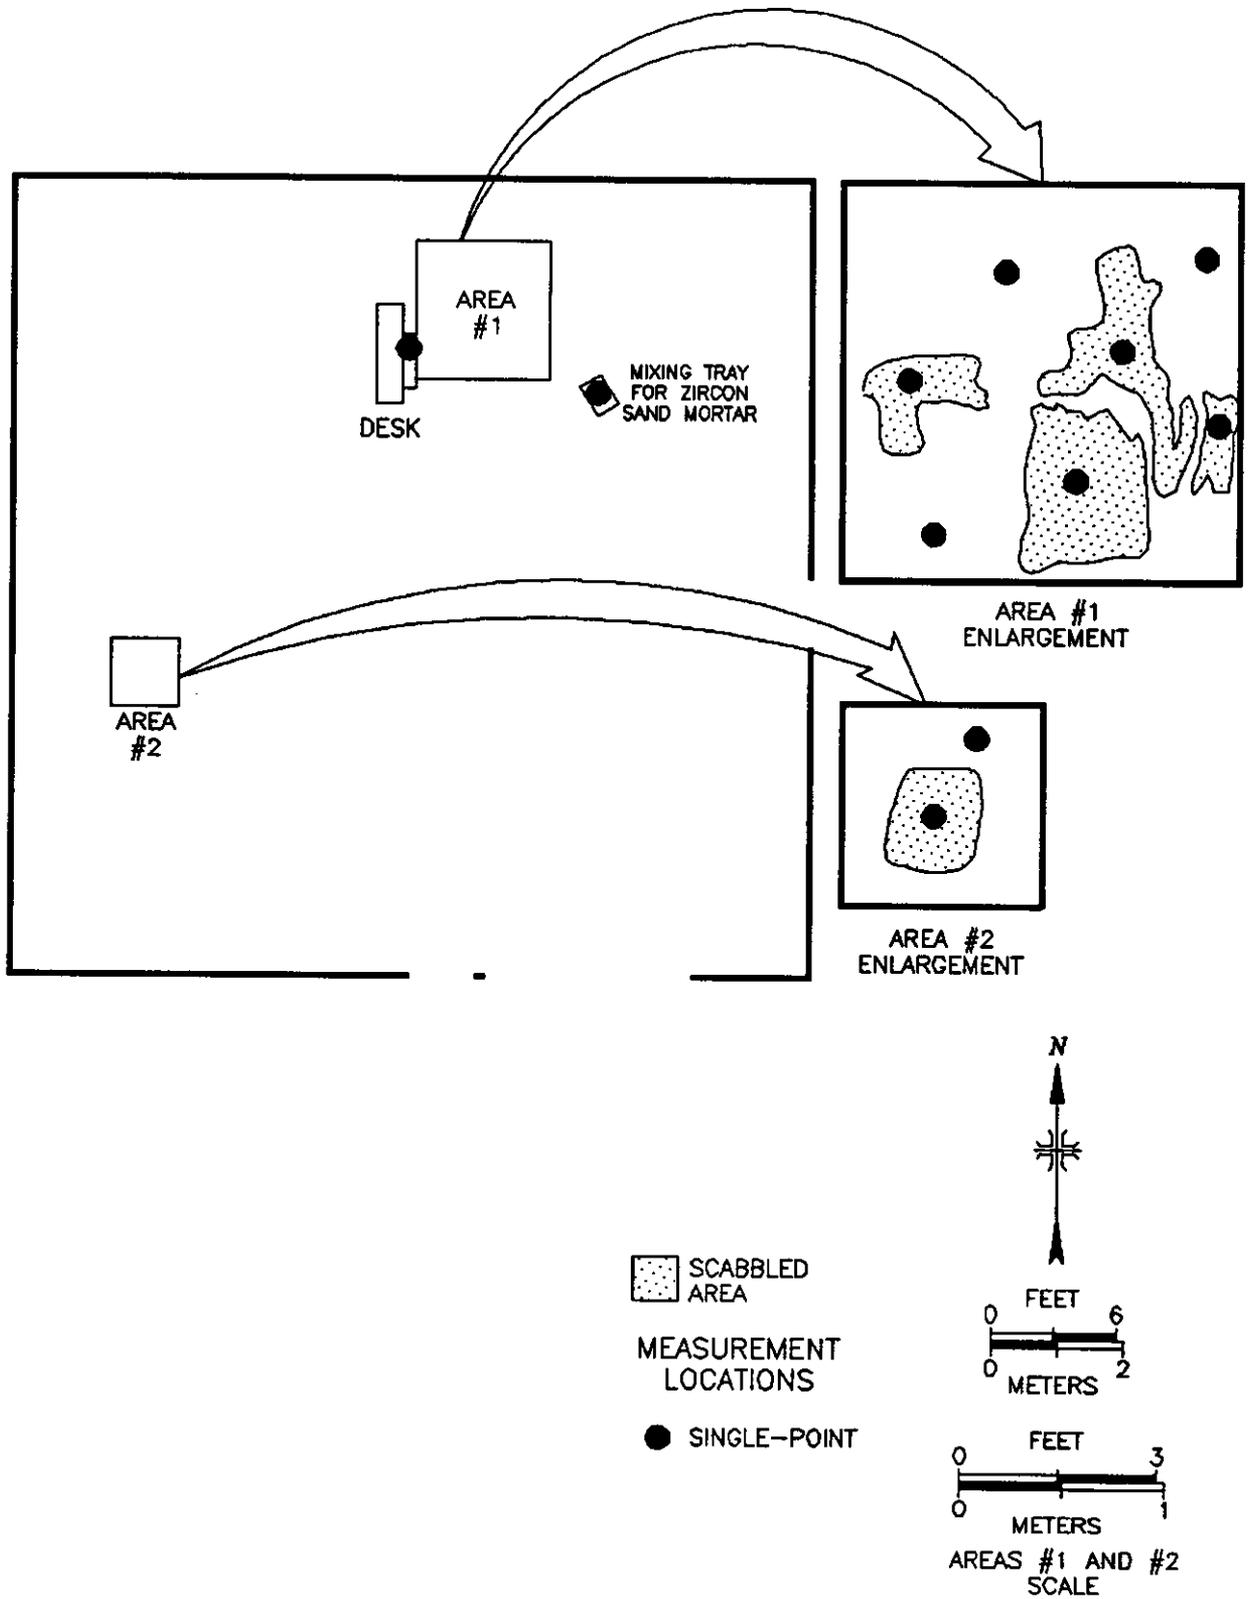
Building 3, Room 101, Indicating Measurement Locations on the Floor
